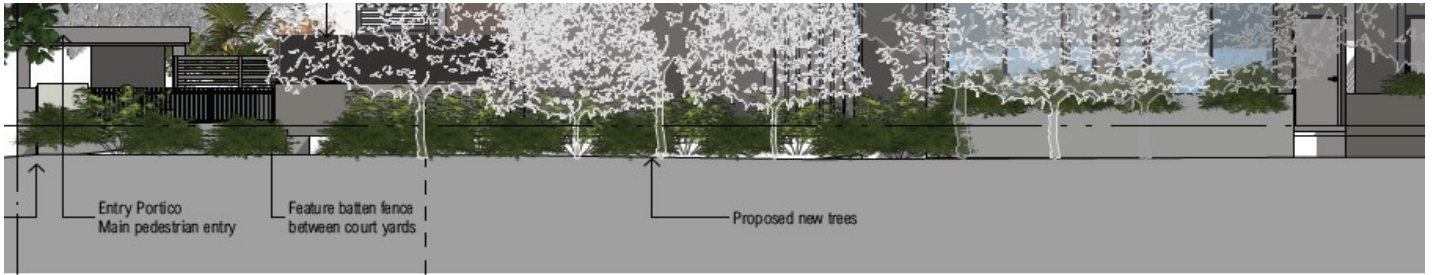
Western Elevation (fencing detail), Drawing No. DA.16, Revision A.
